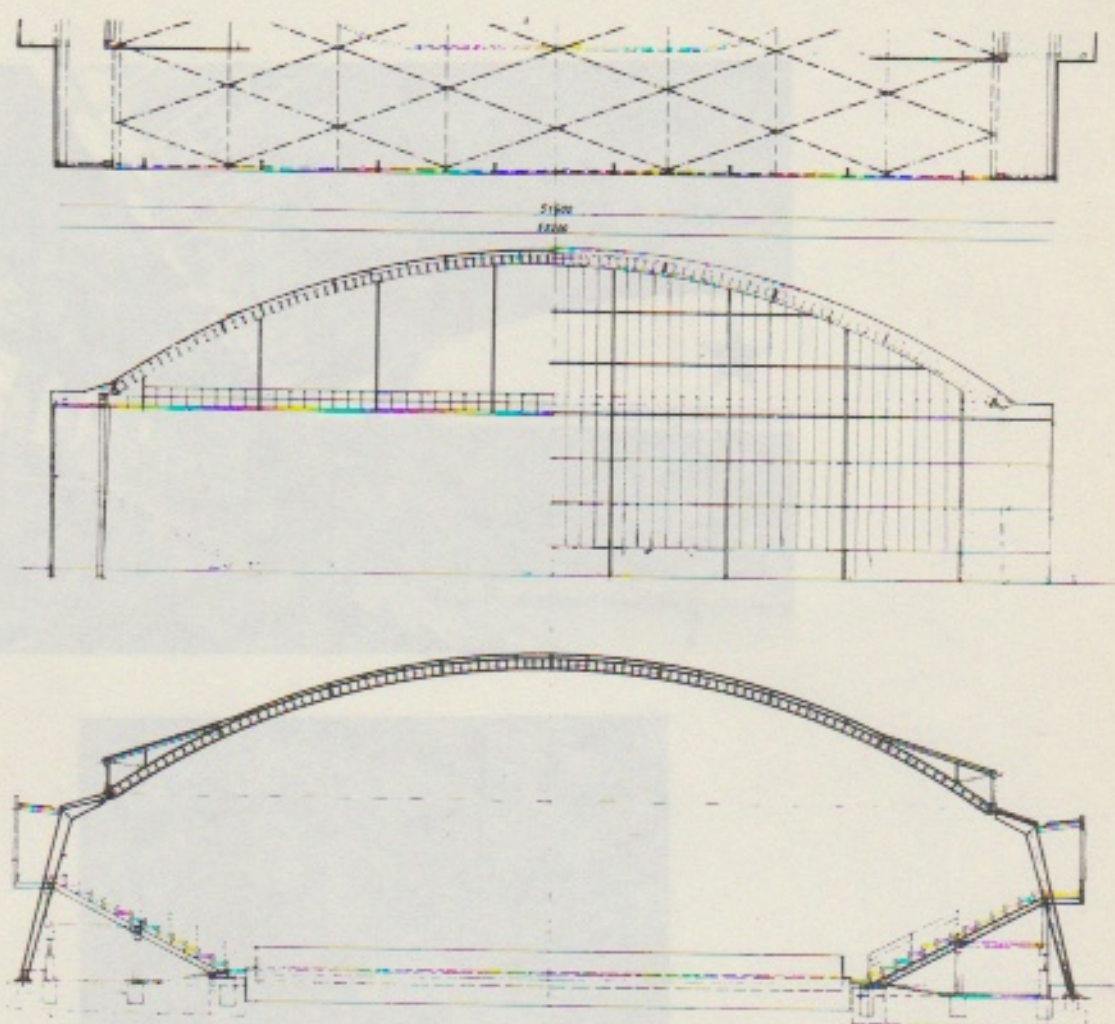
Plan, elevation and cross-section of the double-layer lamella barrel vault in Kroměříž.
